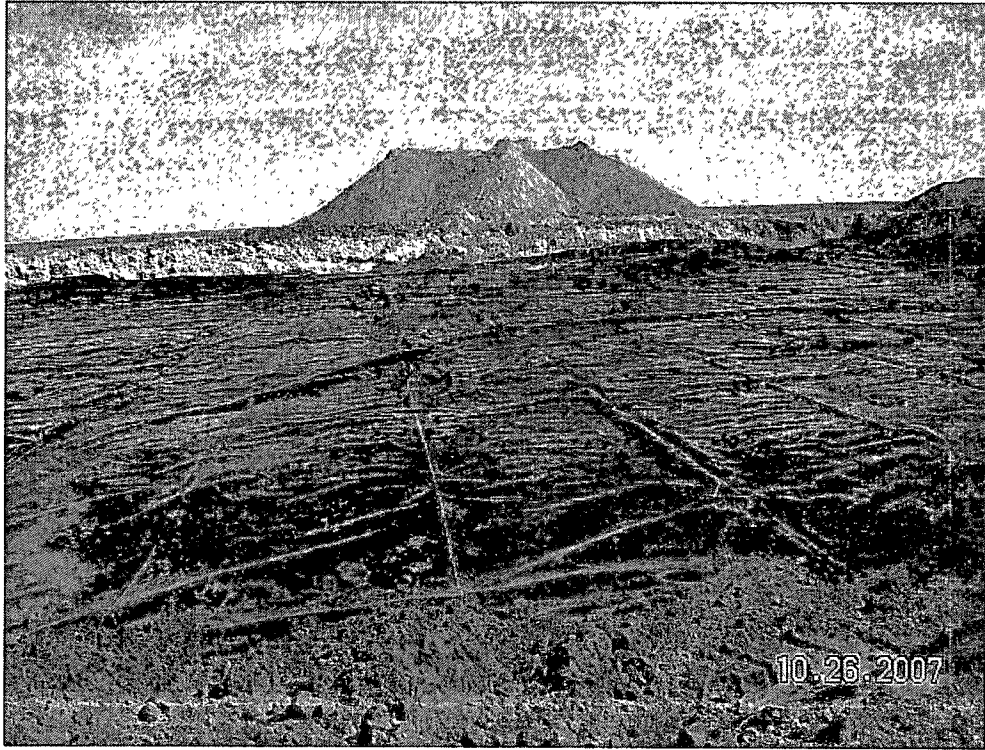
Looking easterly at backfilling of excavation area.
